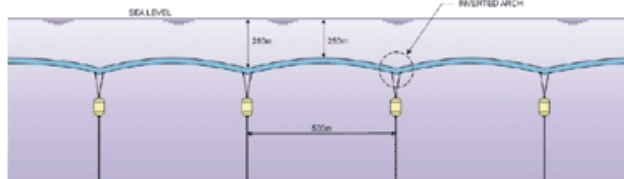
Connection of undersea drinking water between Turkey and Cyprus^[16]
